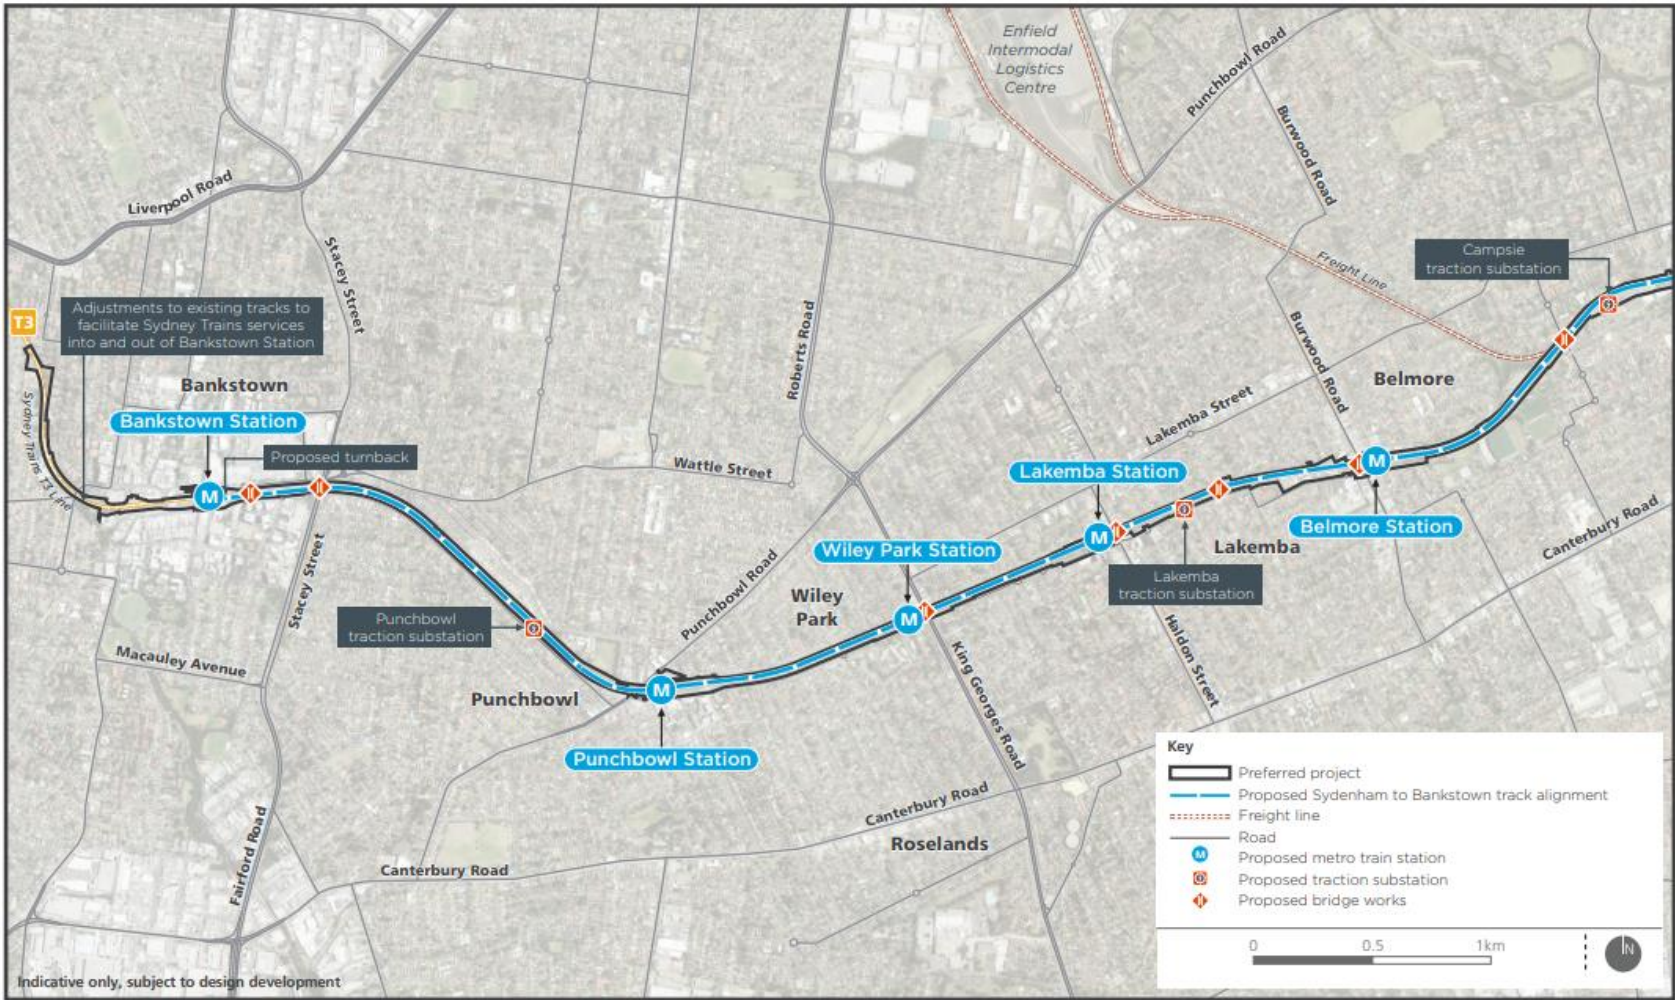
Southwest Metro Corridor Project Site (Source: Sydney Metro City & Southwest – Sydenham to Bankstown – Submissions and Preferred Infrastructure Report, 2018)
